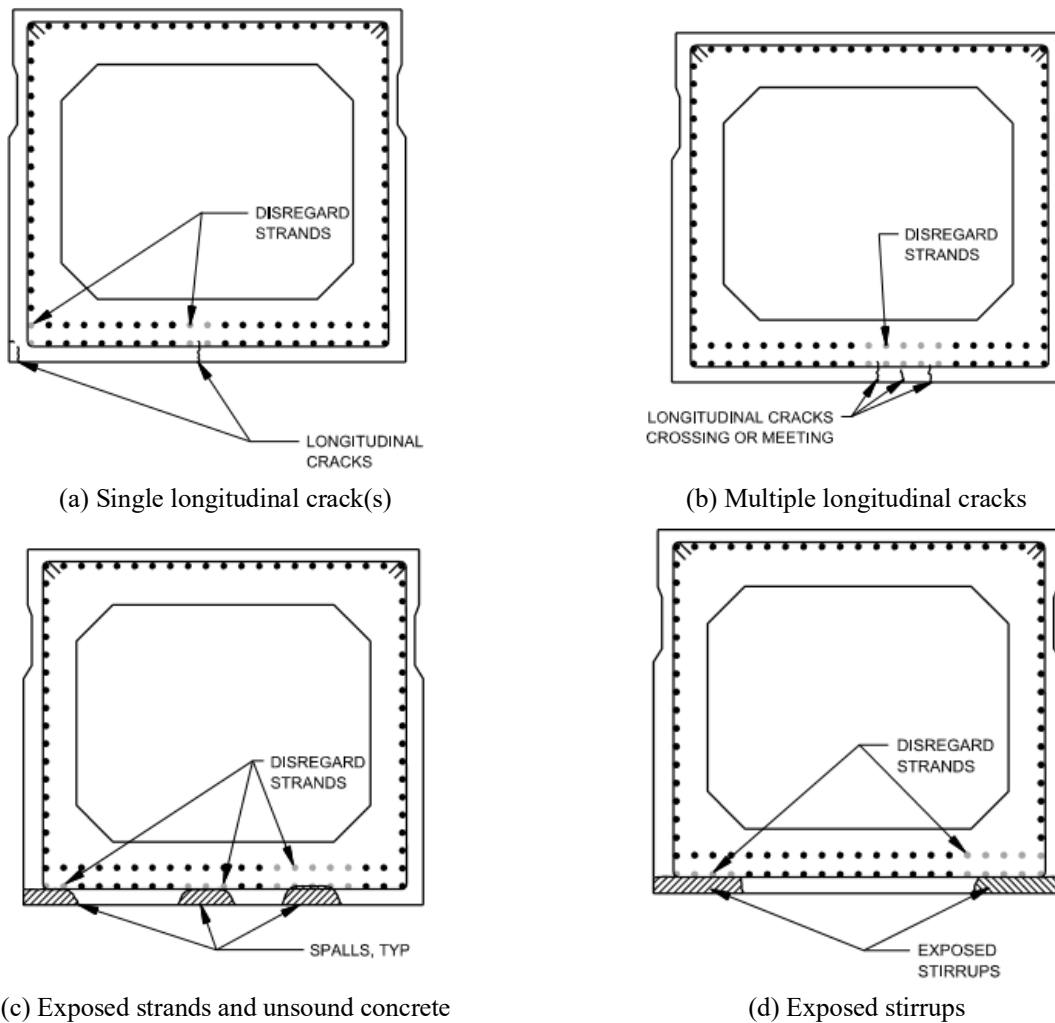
Prestressing strand disregarding procedure in PC deck girders based on the damages in the cross section (UDOT 2017)
